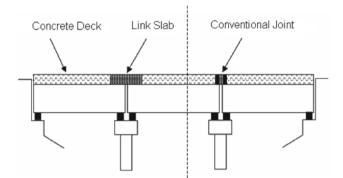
Bridge deck schematic showing SHCC link slab and conventional expansion joints.
